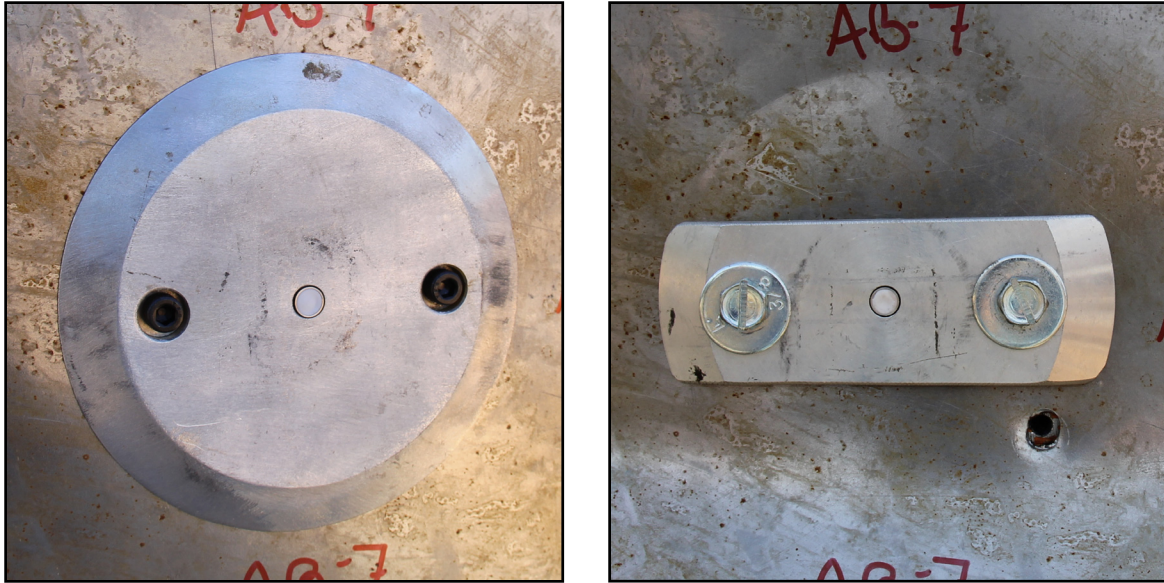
Example of failed cladding to floor plate connection observed during blast testing
